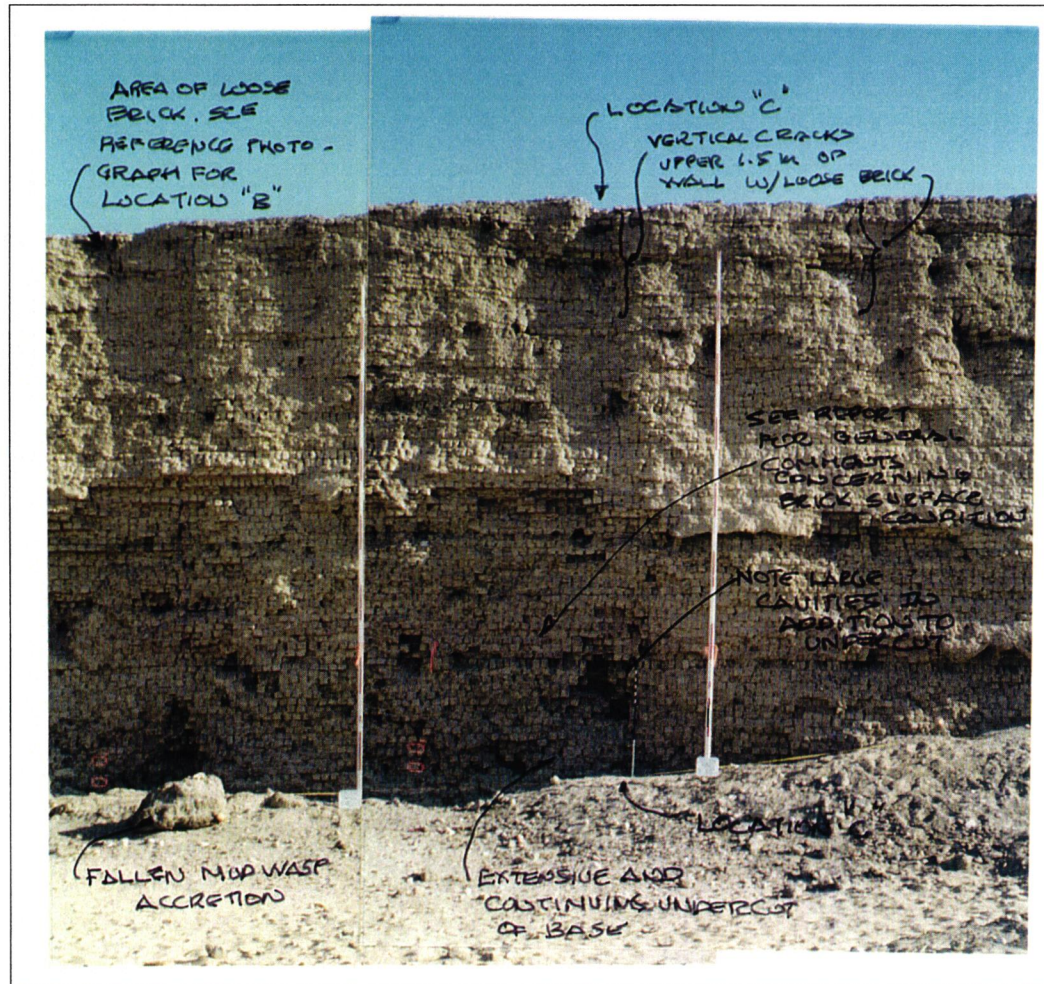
Wall Undercutting at South Main Enclosure Wall
